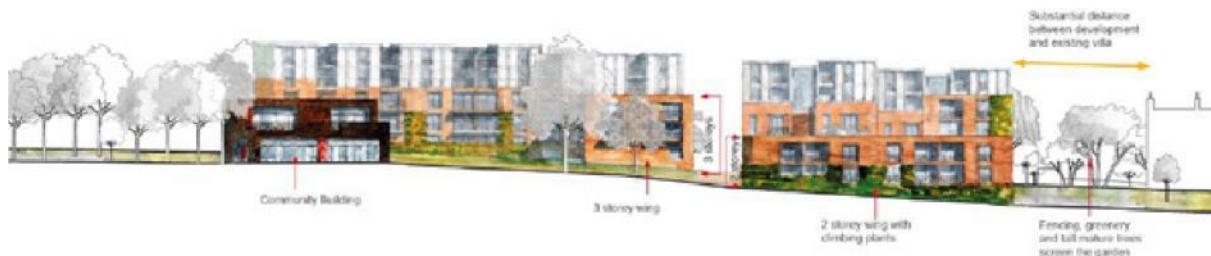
2020 illustrative scheme – Park Elevation (Source: AECOM, 2020)
